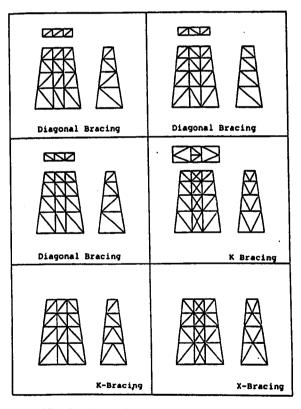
Framing Configurations (Courtesy of Brown & Root Inc) Ref (11) On-site installation is limited to launching and upending the jacket, driving piles, placing the deck structure in a series of modules, and welding all of these into a single unit.
